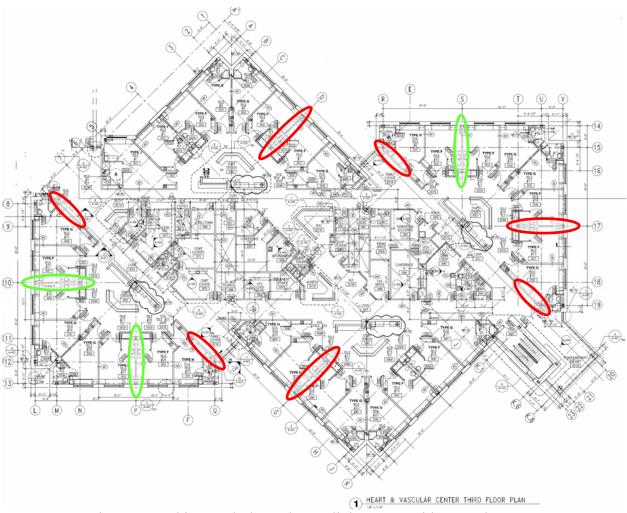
Architectural Floor Plan outlining areas with Braced Frames
